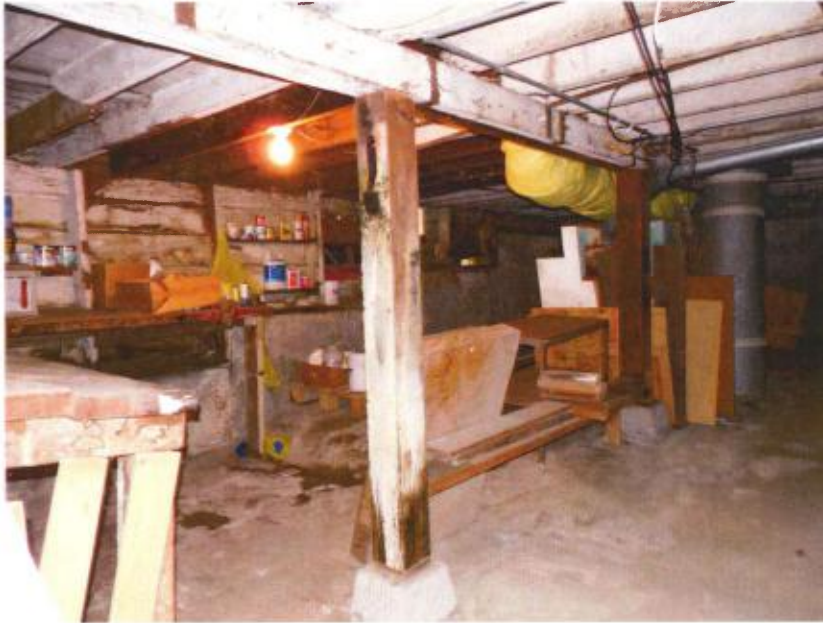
The storage area, which is located under the rectangular footprint of the original building, barely has enough room to stand at the back of the building. The floor slopes up towards the front of the building, where headroom drops to 5'-0".
